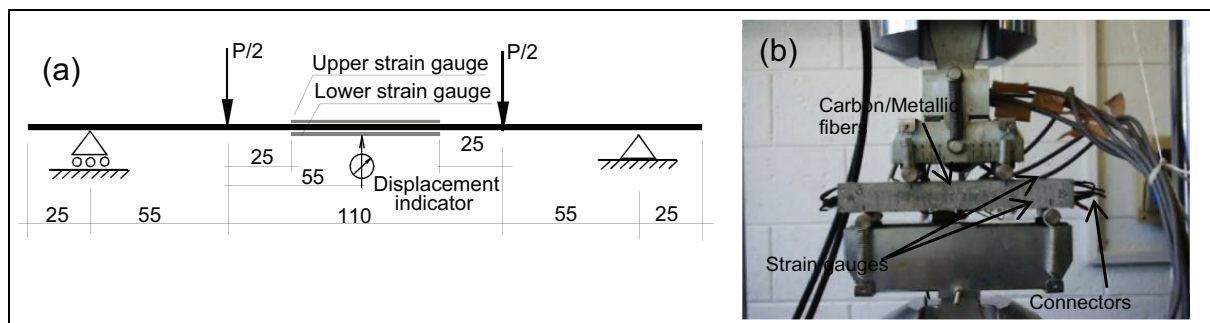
Four-point bending test of TRC beams: (a) loading scheme and “external” sensing (dimension in millimeters) and (b) the test specimen and the testing rig.
